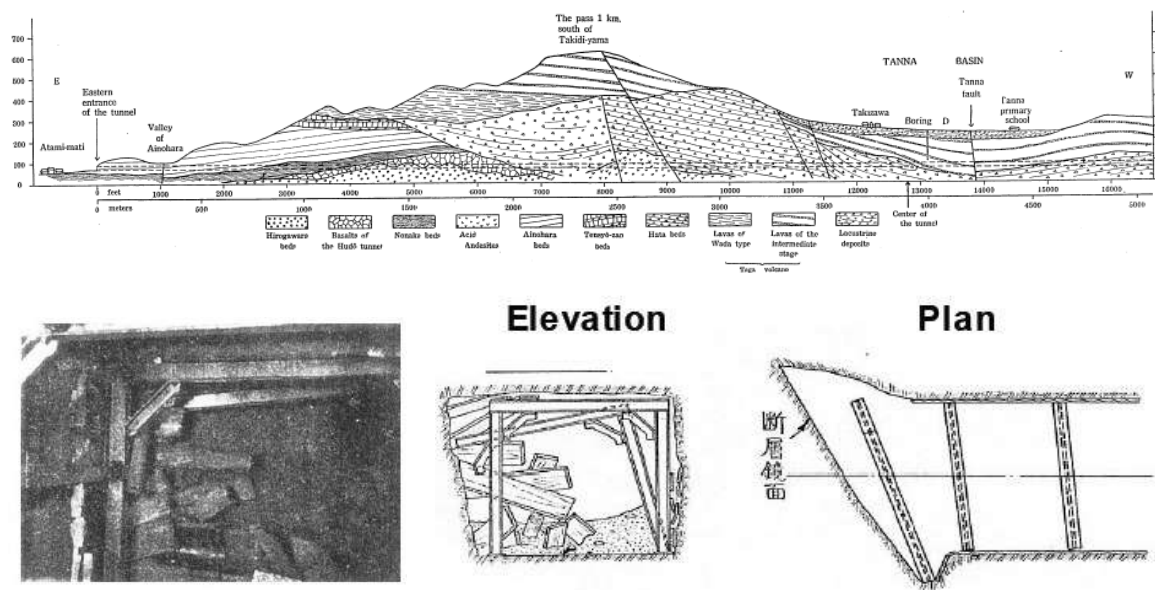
Geology of Tanna tunnel and damage at tunnel heading by the earthquake (arranged from Kuno (1935) and Sakurai (1999))
